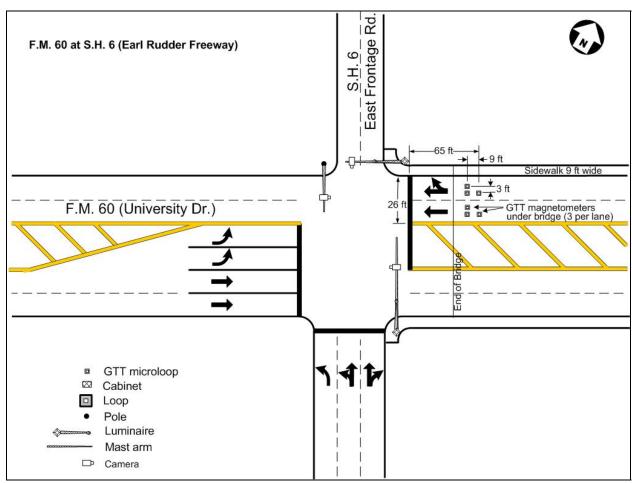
F.M. 60 and S.H. 6 East Frontage Road in College Station.
